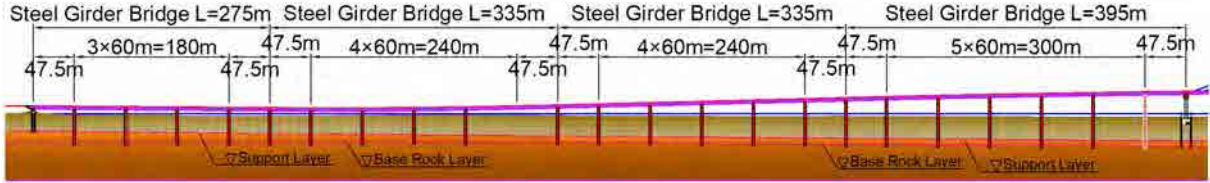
Layout of the Left Bank Approach Bridge (Route3)
